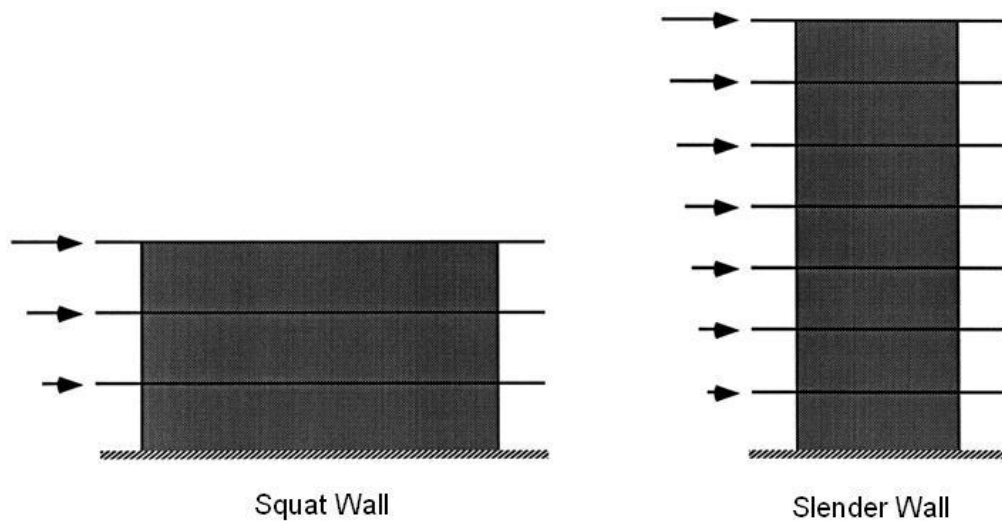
Types of Structural Walls (Aejaz and Wight (1990))
